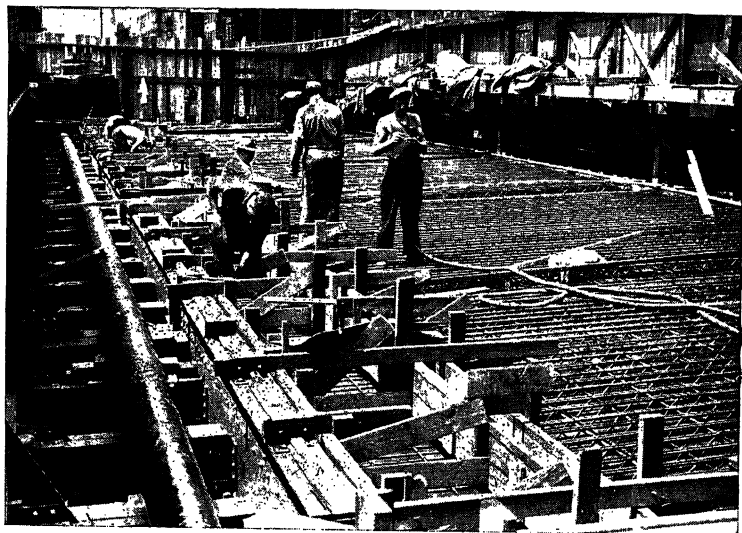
Trussed reinforcement in the roadway of the West Thirty-seventh St. Bridge over the New York approach to the Lincoln Tunnel.
